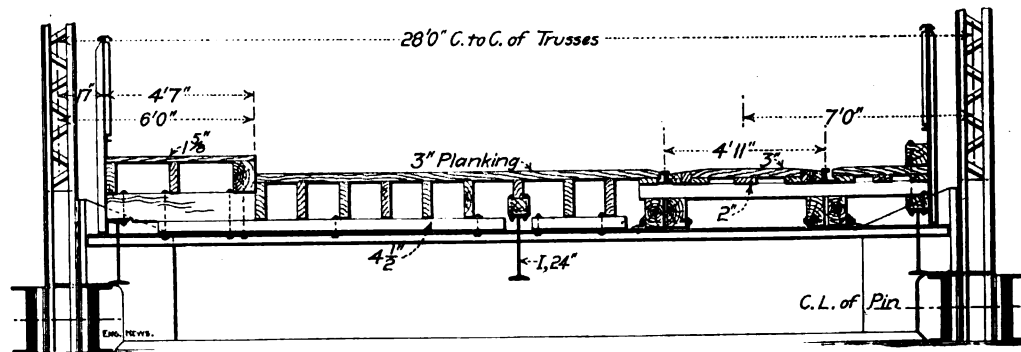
CROSS-SECTION OF FLOOR SYSTEM OF 600-FT. SPAN; OHIO RIVER BRIDGE, MARIETTA, O.
